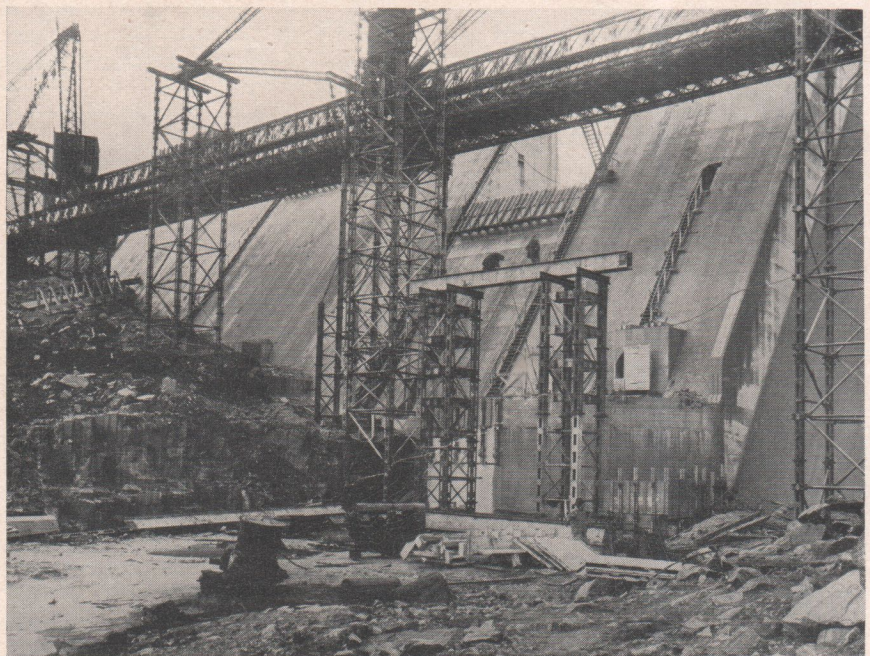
Mullardoch dam, south spillway stilling-pool section, showing the Bailey bridge carrying the rails for the concrete trolleys
